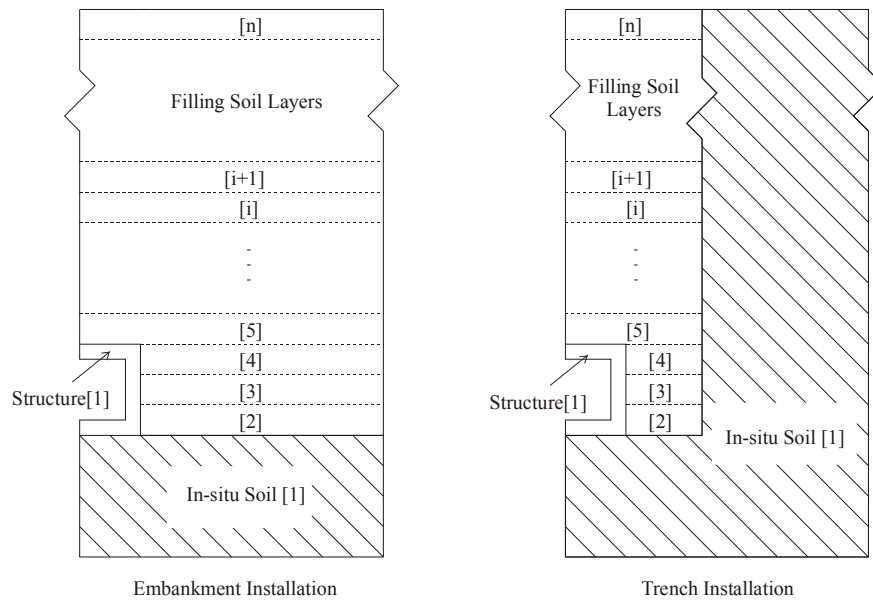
Incremental Sequences for Embankment and Trench Installations
